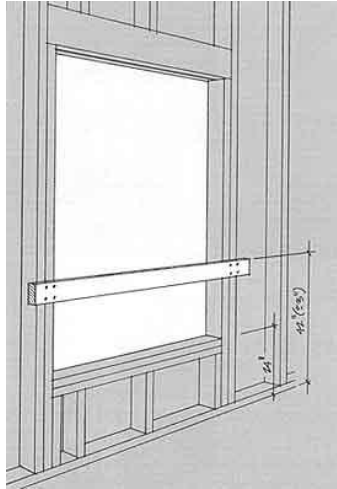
This window opening has a guardrail because the bottom sill height is less than 39 inches. Because the distance between the studs is less than 18 inches, no guardrails are needed between the studs.
